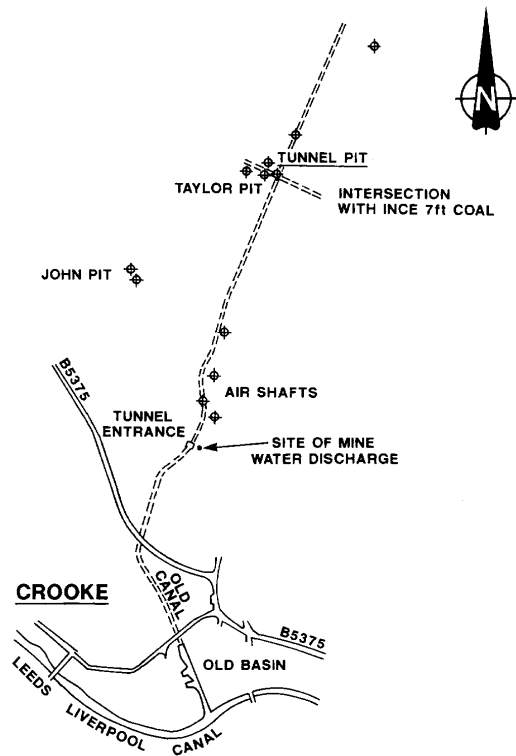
Plan showing the underground canal at Tunnel Pit, Crooke
